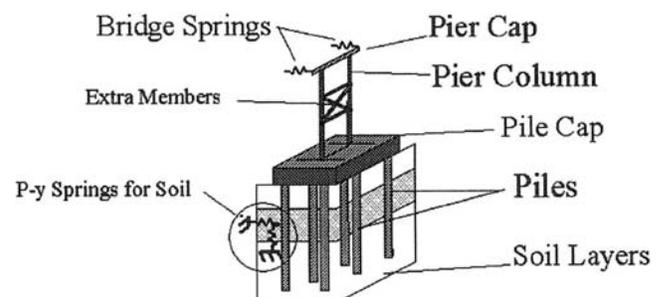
Florida pier model for structure and foundation elements (Hoit et al. 1997).
